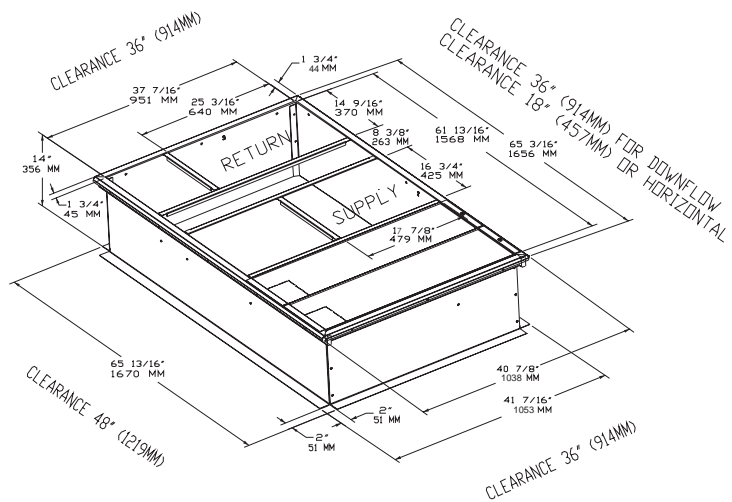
Heat Pump Models - 3-4 Tons - R-410A - Roof Curb
